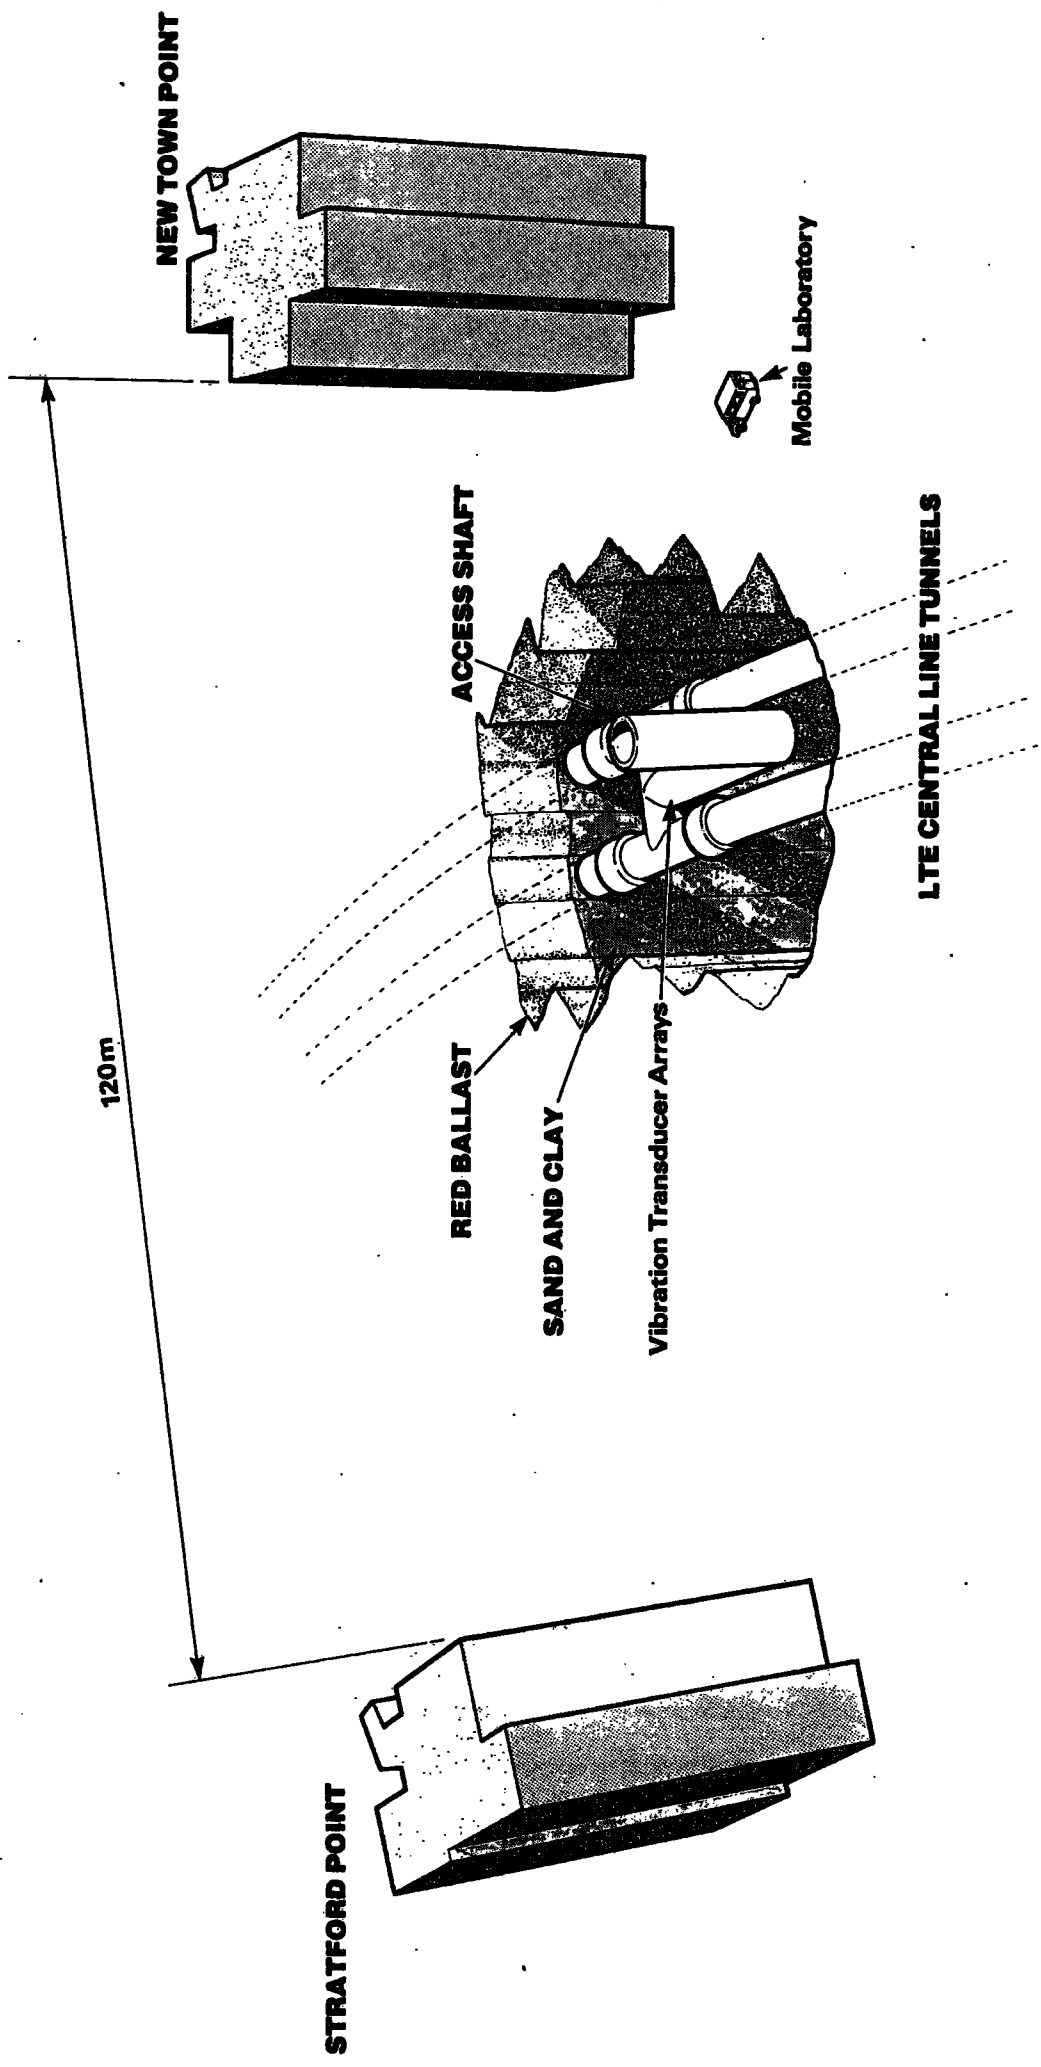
NEWHAM DEMOLITION SITE LAYOUT
